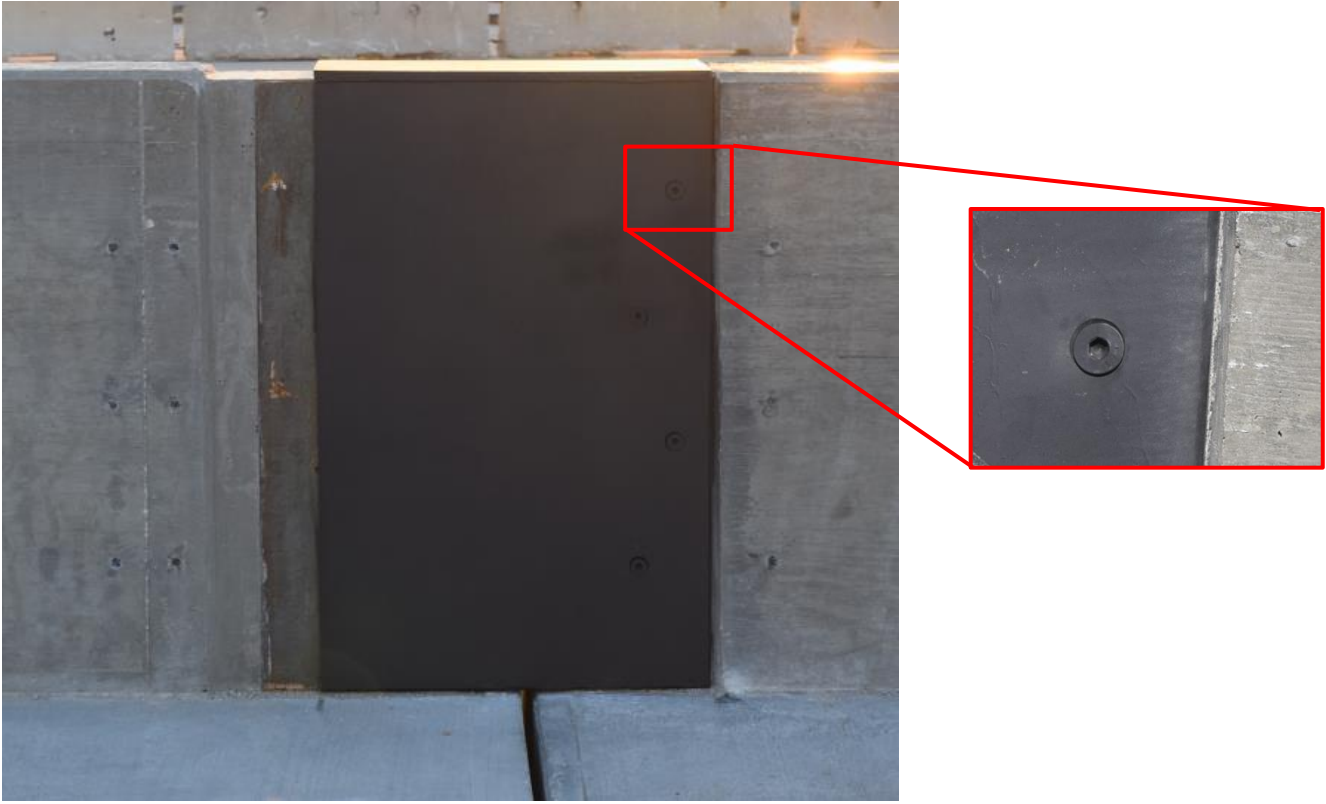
Barrier Joint Photographs, Test No. MAN-1
